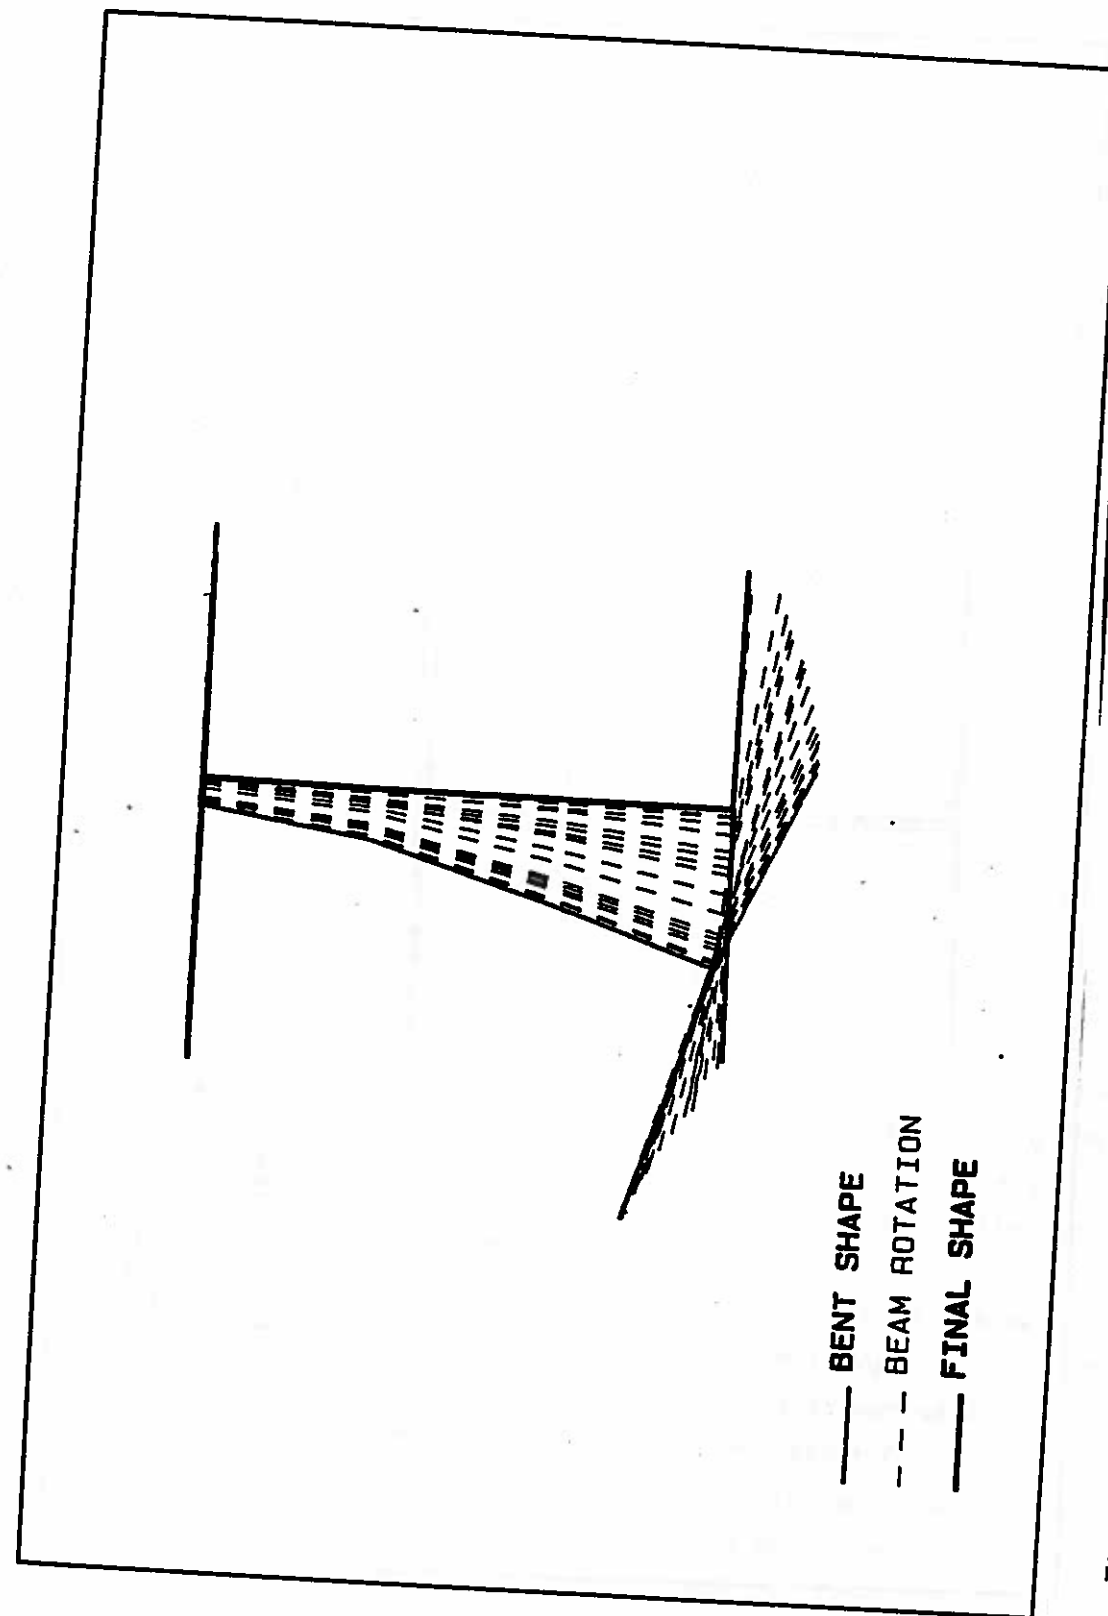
Rotational heat-straightening progression of the damaged girder specimen SB-1 (section at point 16).
